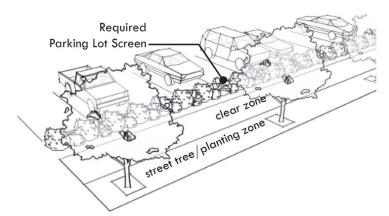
Illustration of Required Parking Lot Screening
